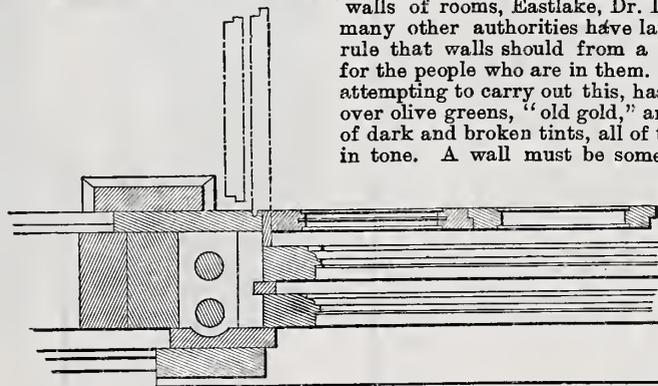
Horizontal Section through Windows and Inside Blinds.—Scale, 1½ Inches to the Foot.
